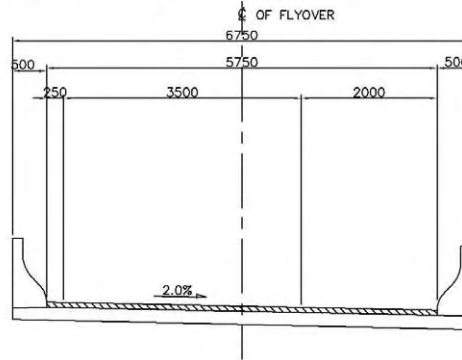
(2/3) TYPICAL CROSS SECTION OF FLYOVER
